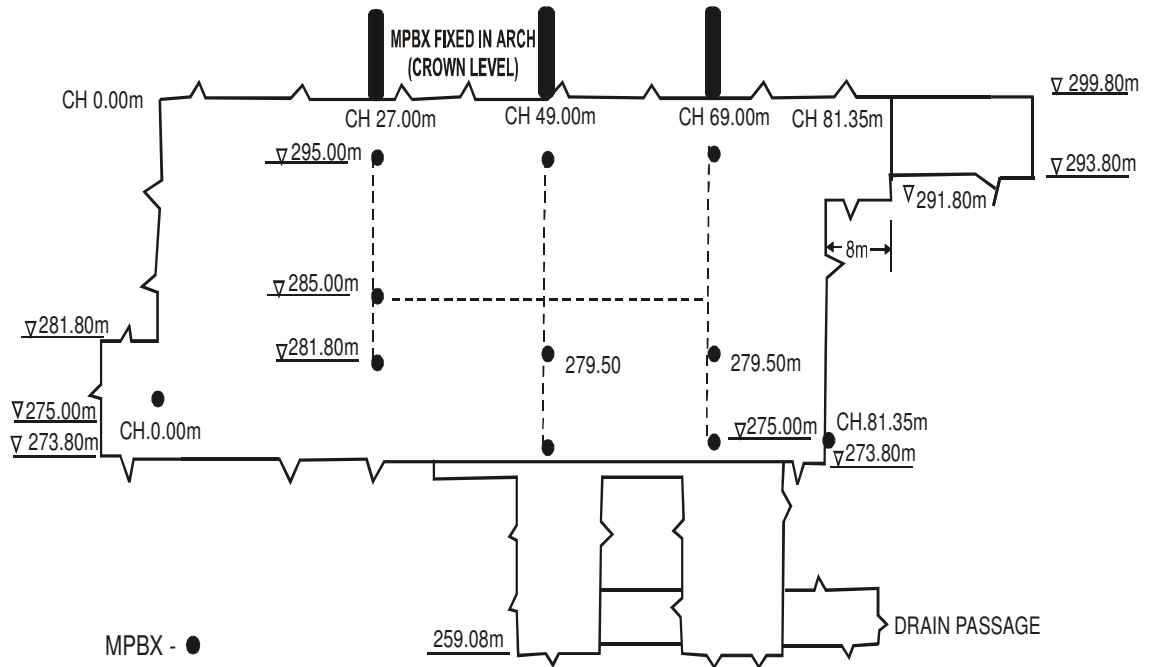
L-section of Transformer hall showing upstream wall with instrument locations and cable layout
